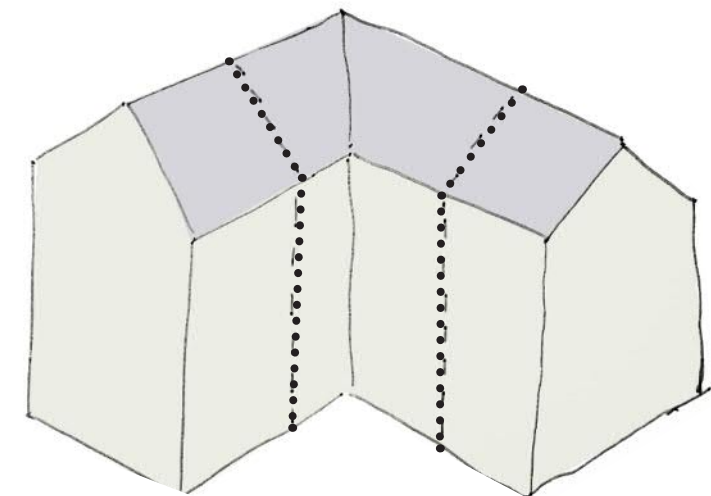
A large building such as a former agricultural building can be split into smaller dwellings or provide one large dwelling
